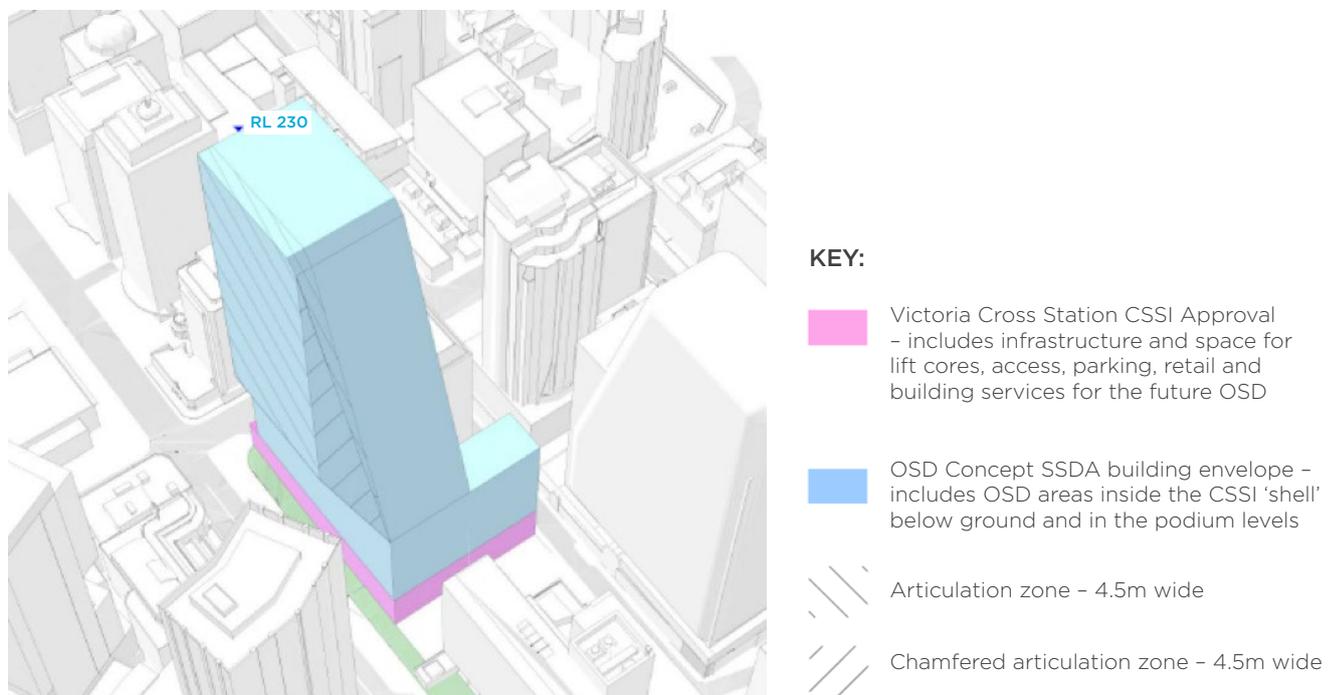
Axonometric view – amended building envelope incorporating the articulation zone
